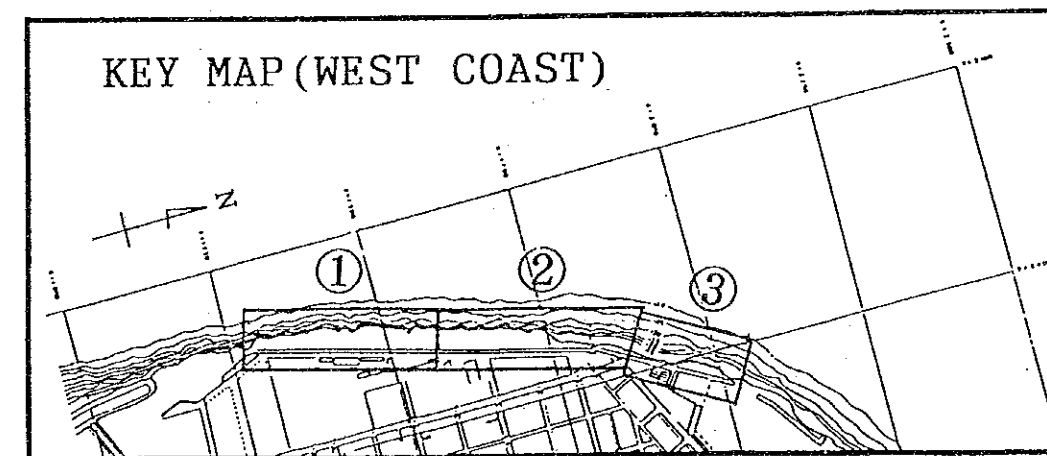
Layout of Shore Protection Facilities on the West Coast
